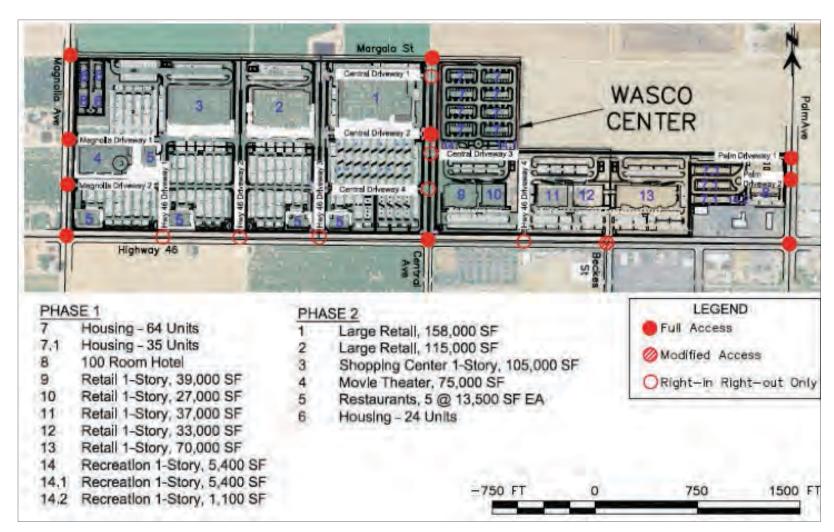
Illustrative Wasco Center site plan indicating major development figures and circulation concepts.
